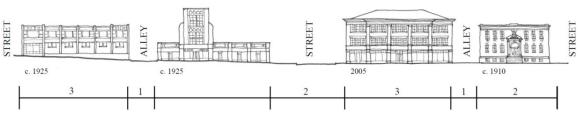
Infill buildings should be designed to maintain the rhythm of buildings in the streetscape as well as be inherently harmonious. The 2005 infill building incorporates the forms, window types, materials, and massing of adjacent buildings.
